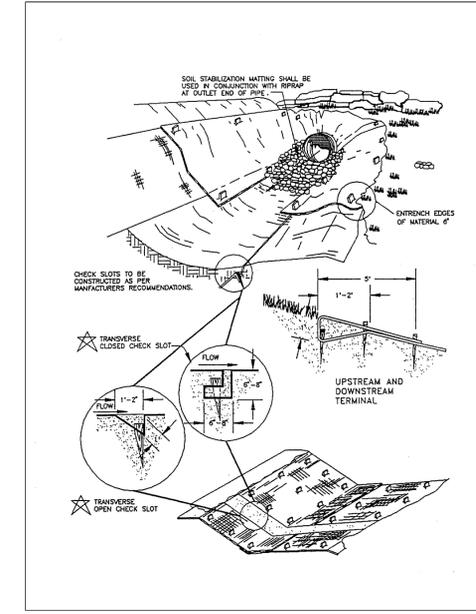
Typical Treatment 2 – Soil Stabilization Matting Installation
